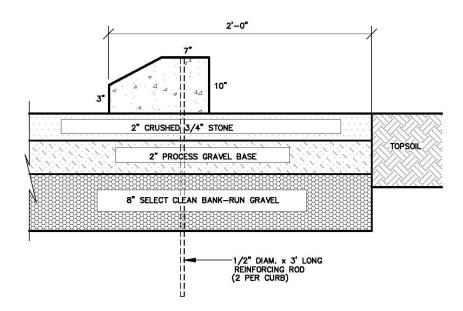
Example detail of concrete wheel stop installed in gravel parking lot
